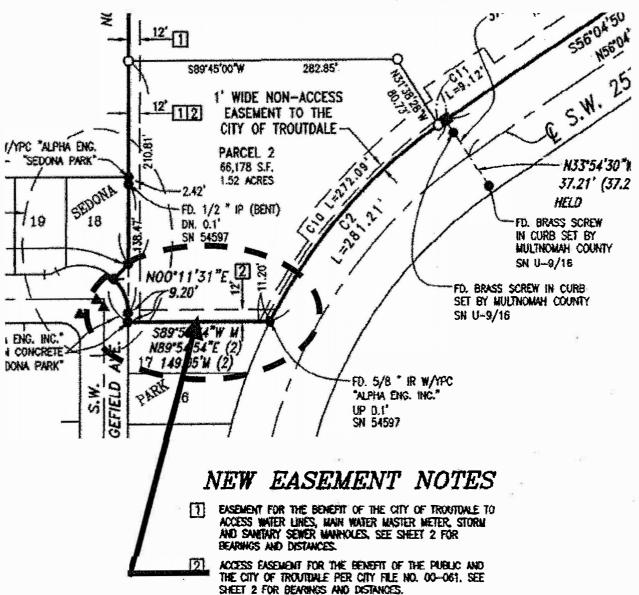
FOOT EASEMENT FROM PARTITION PLAT NO. 2002-79
